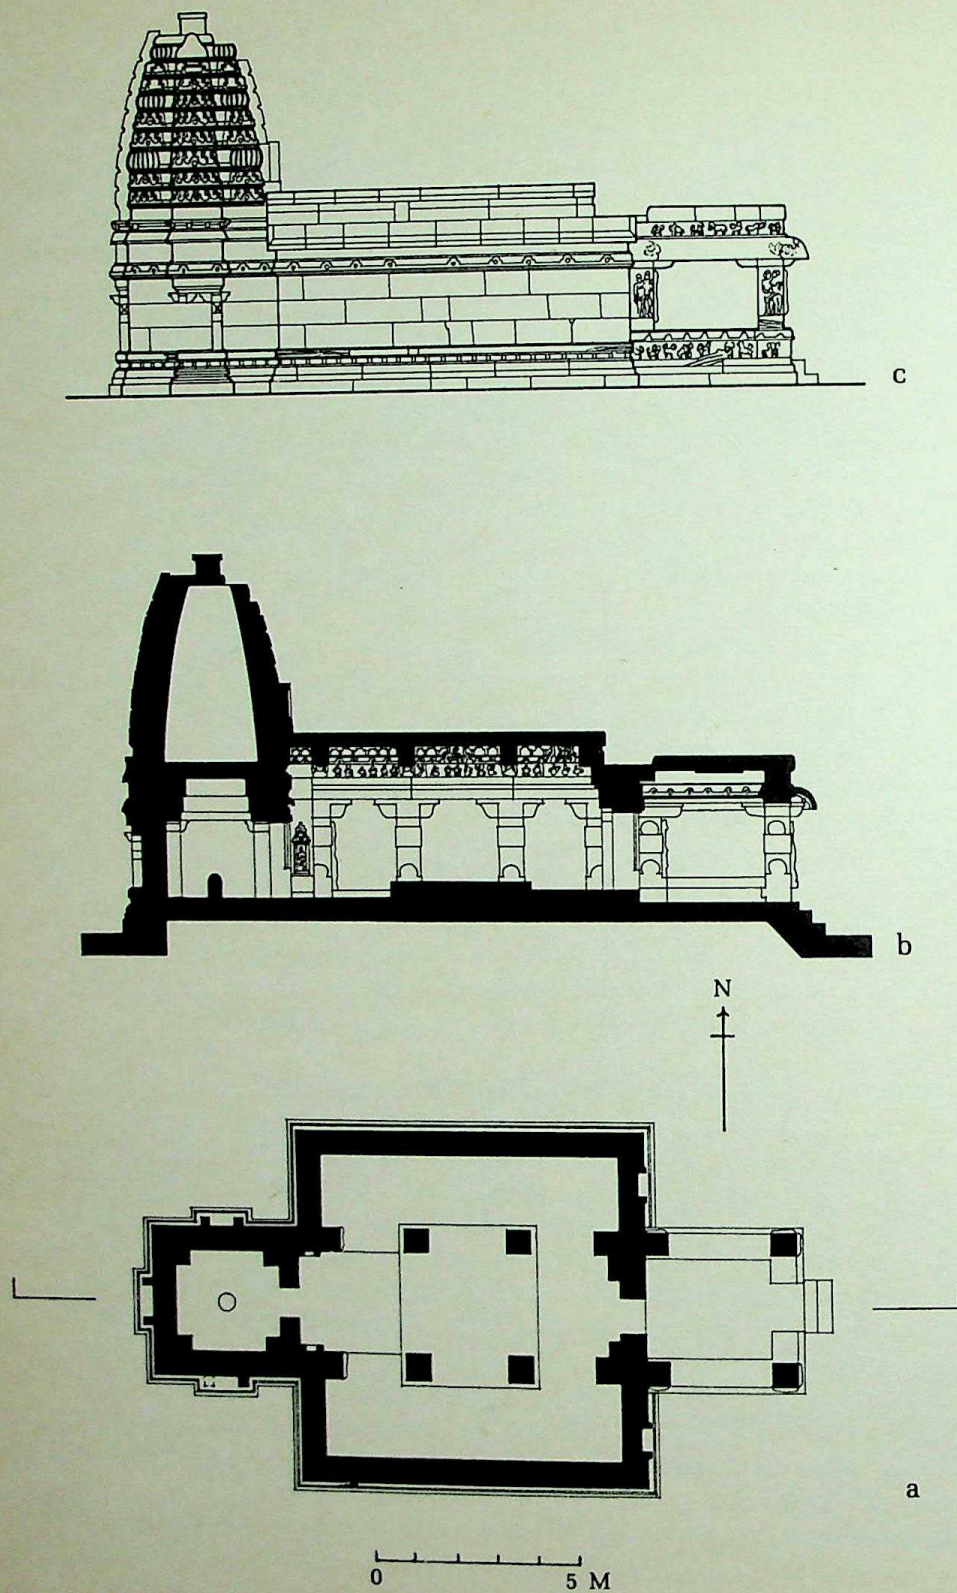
Aihole. Huccapayya temple: a. plan; b. section; c. elevation. (Courtesy: Michell.)
